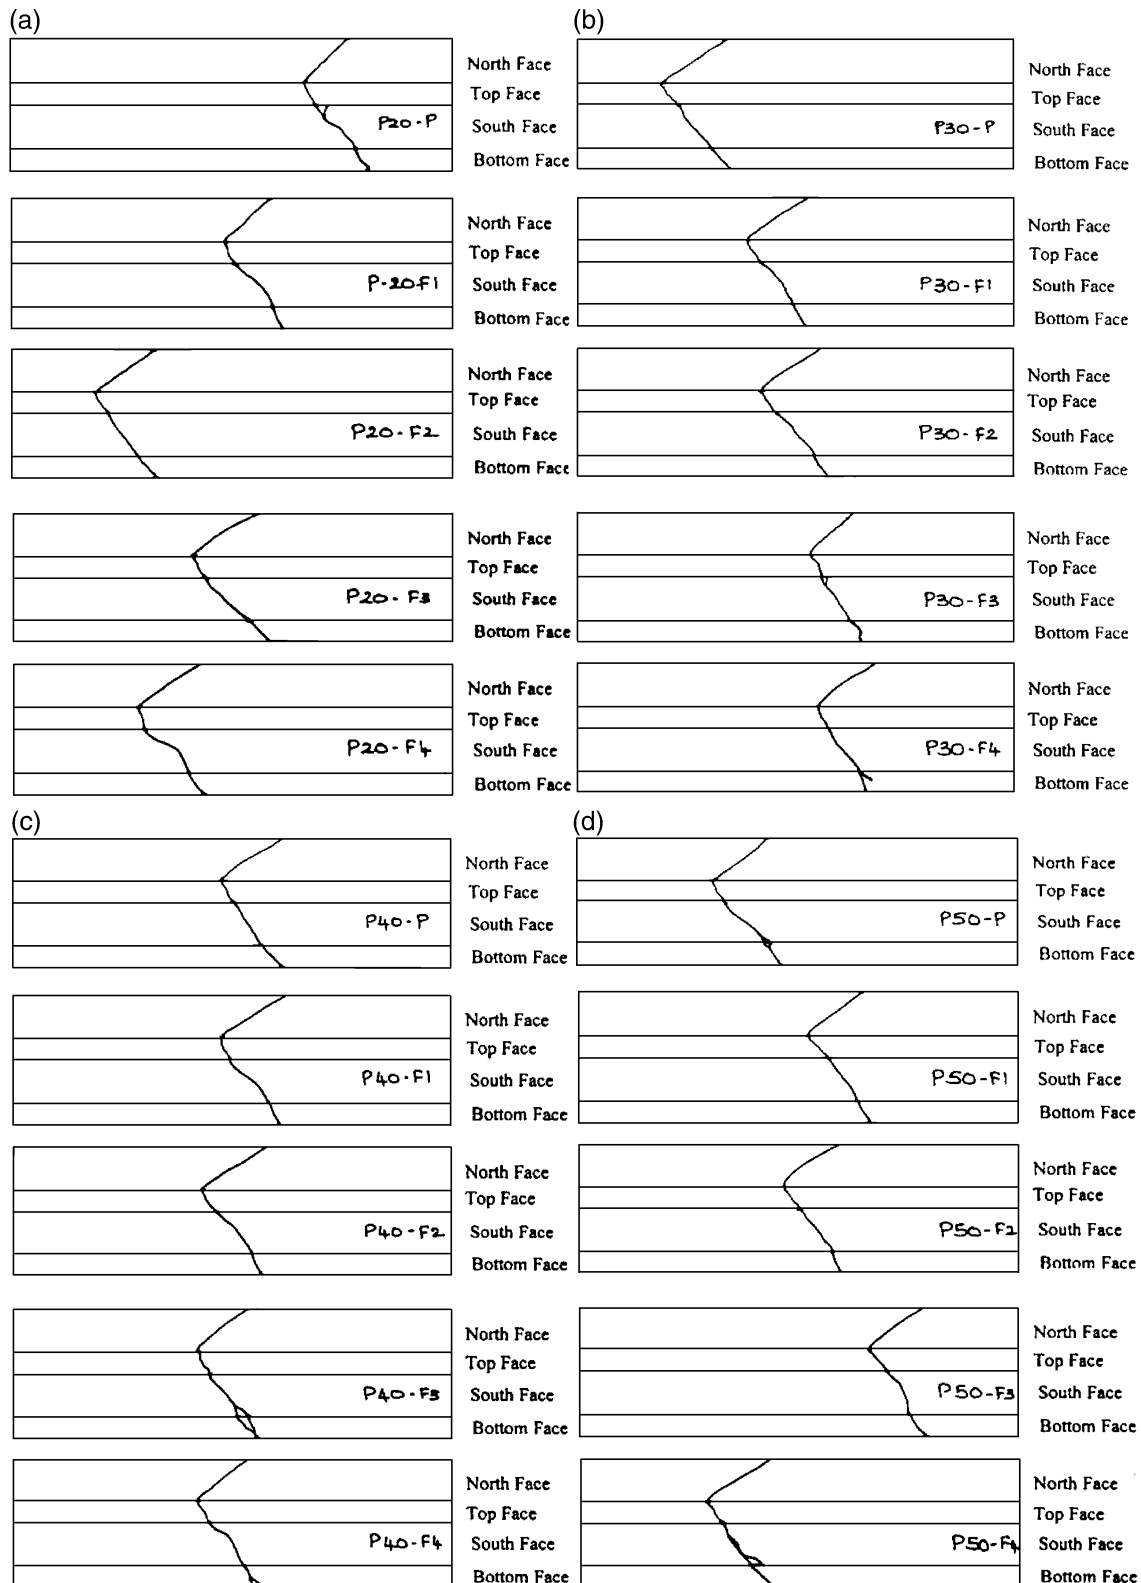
(a) Crack pattern of fibrous beams with concrete strength 20 MPa. (b) Crack pattern of fibrous beams with concrete strength 30 MPa. (c) Crack pattern of fibrous beams with concrete strength 30 MPa. (d) Crack pattern of fibrous beams with concrete strength 50 MPa.
